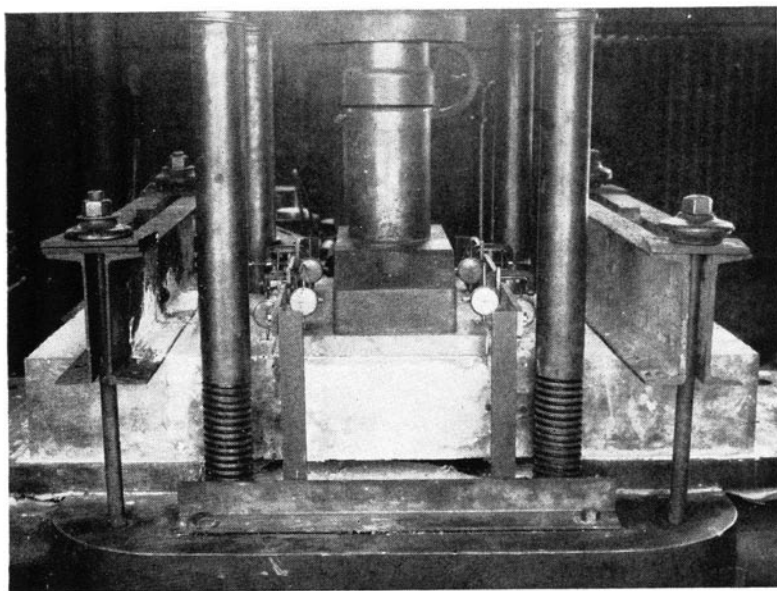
SLAB AND TESTING APPARATUS, LOAD TRANSFER TESTS.
